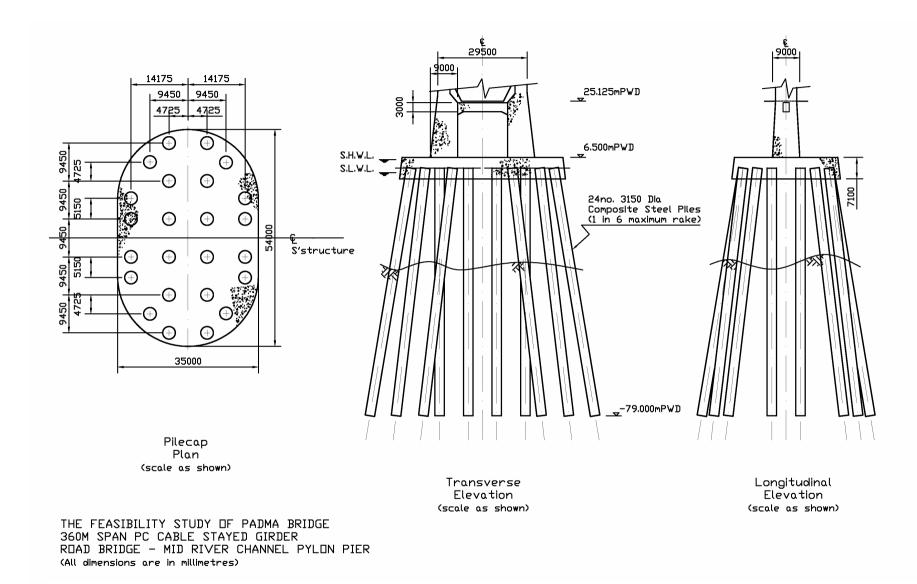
Mid-River Pylon Substructure General Arrangement (Alternative-H2)
